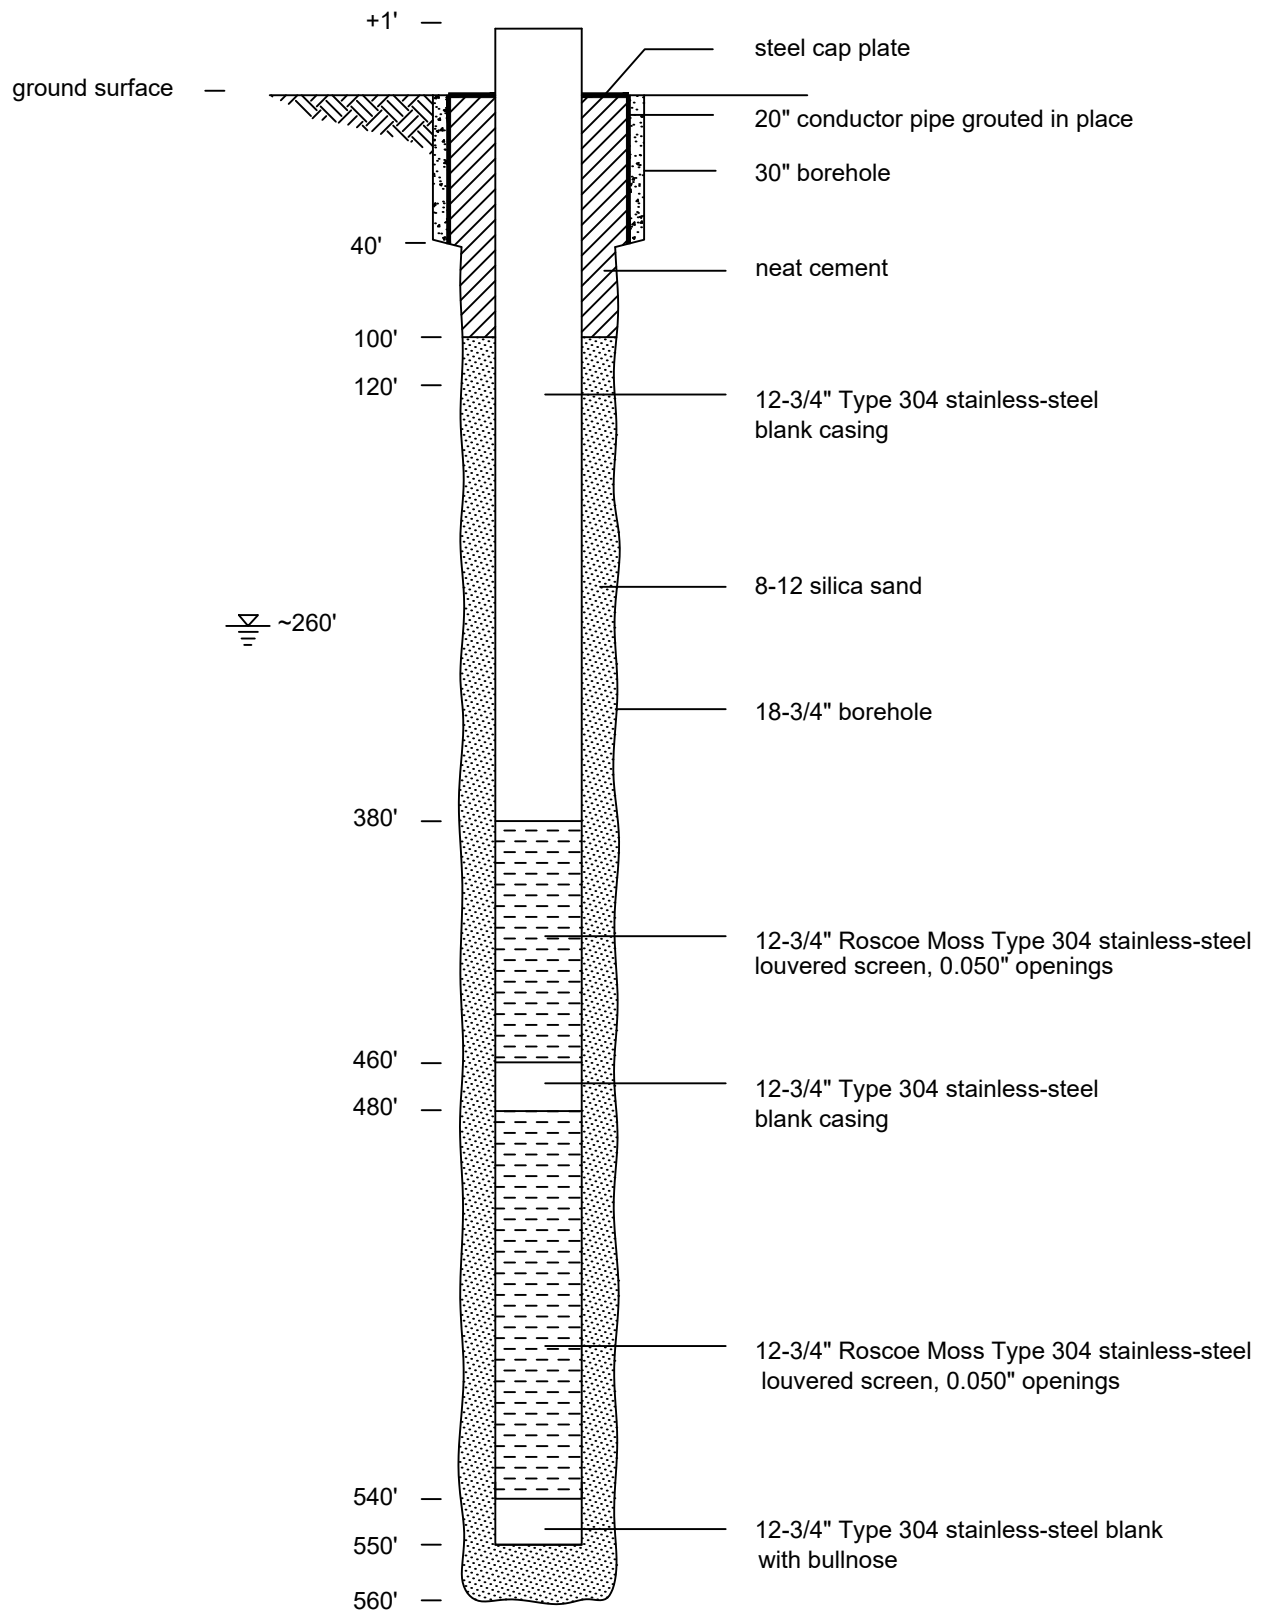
Proposed completion diagram for Village of Tularosa Stogden Replacement Well, (location at 1701 Central Ave.) Otero County, New Mexico.
